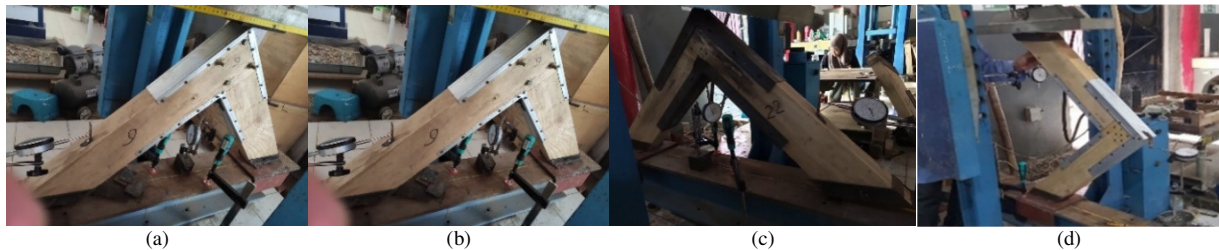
(a), (b) Test of bridle joints with various fasteners, (c), (d) loading positions.
